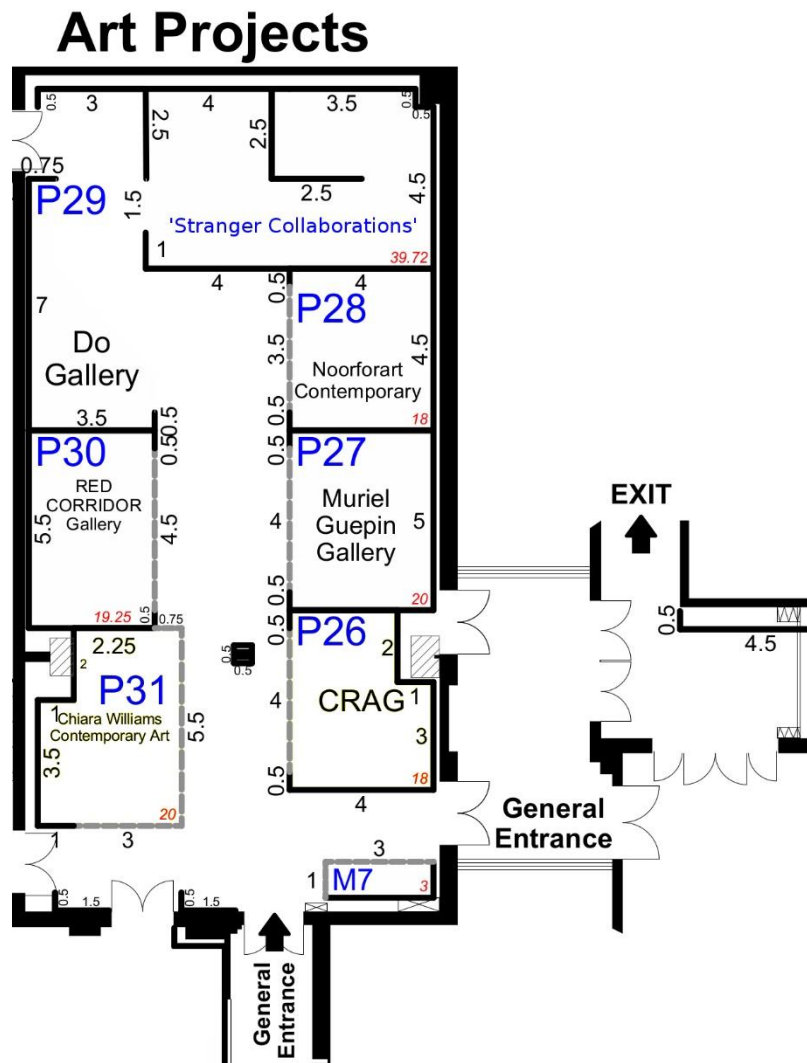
Section of London Art Fair 2017 floorplan showing area containing 'Stranger Collaborations'
